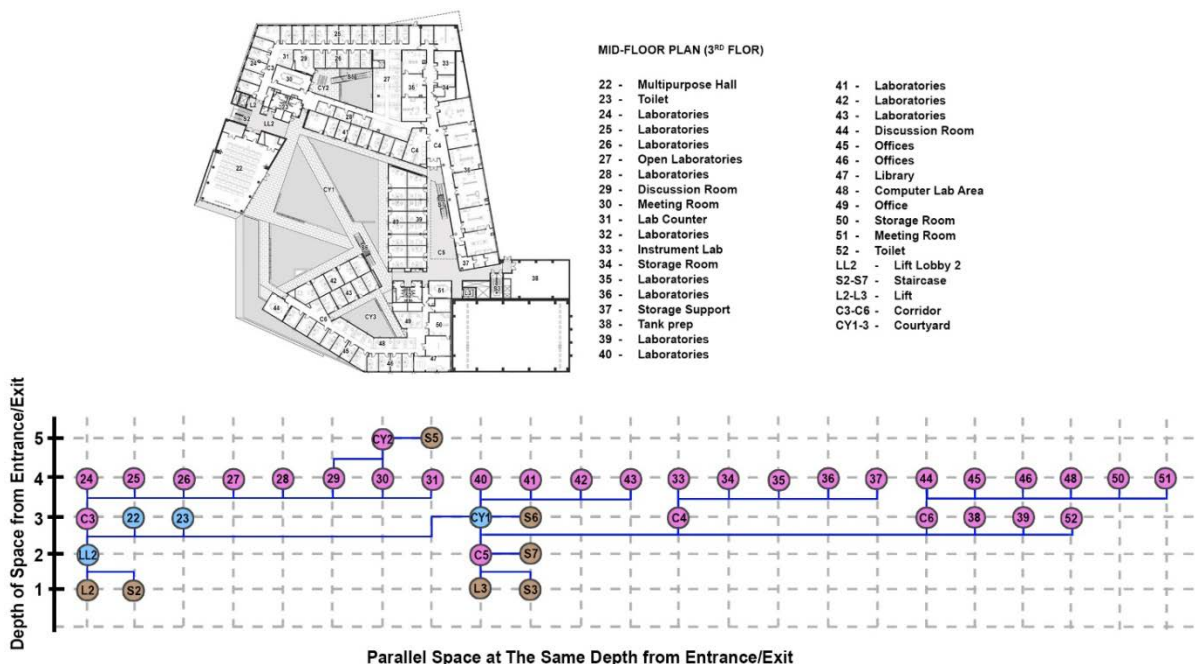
Mid-Floor Plan(3rd Floor), Legend and Justified Graph showing Mid-Floor plan's circulation in NOAA Southwest Fisheries Science Center
